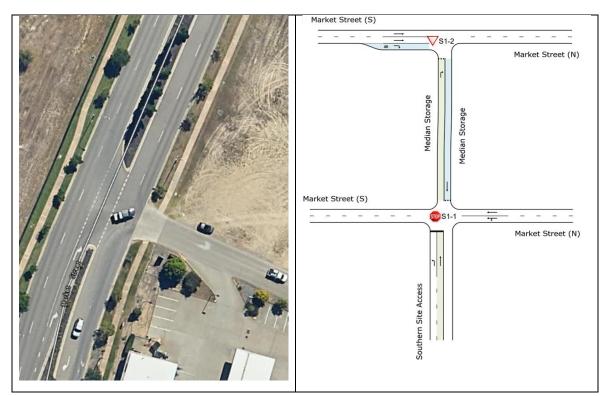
Market Street / Southern Site Access Intersection Layout
